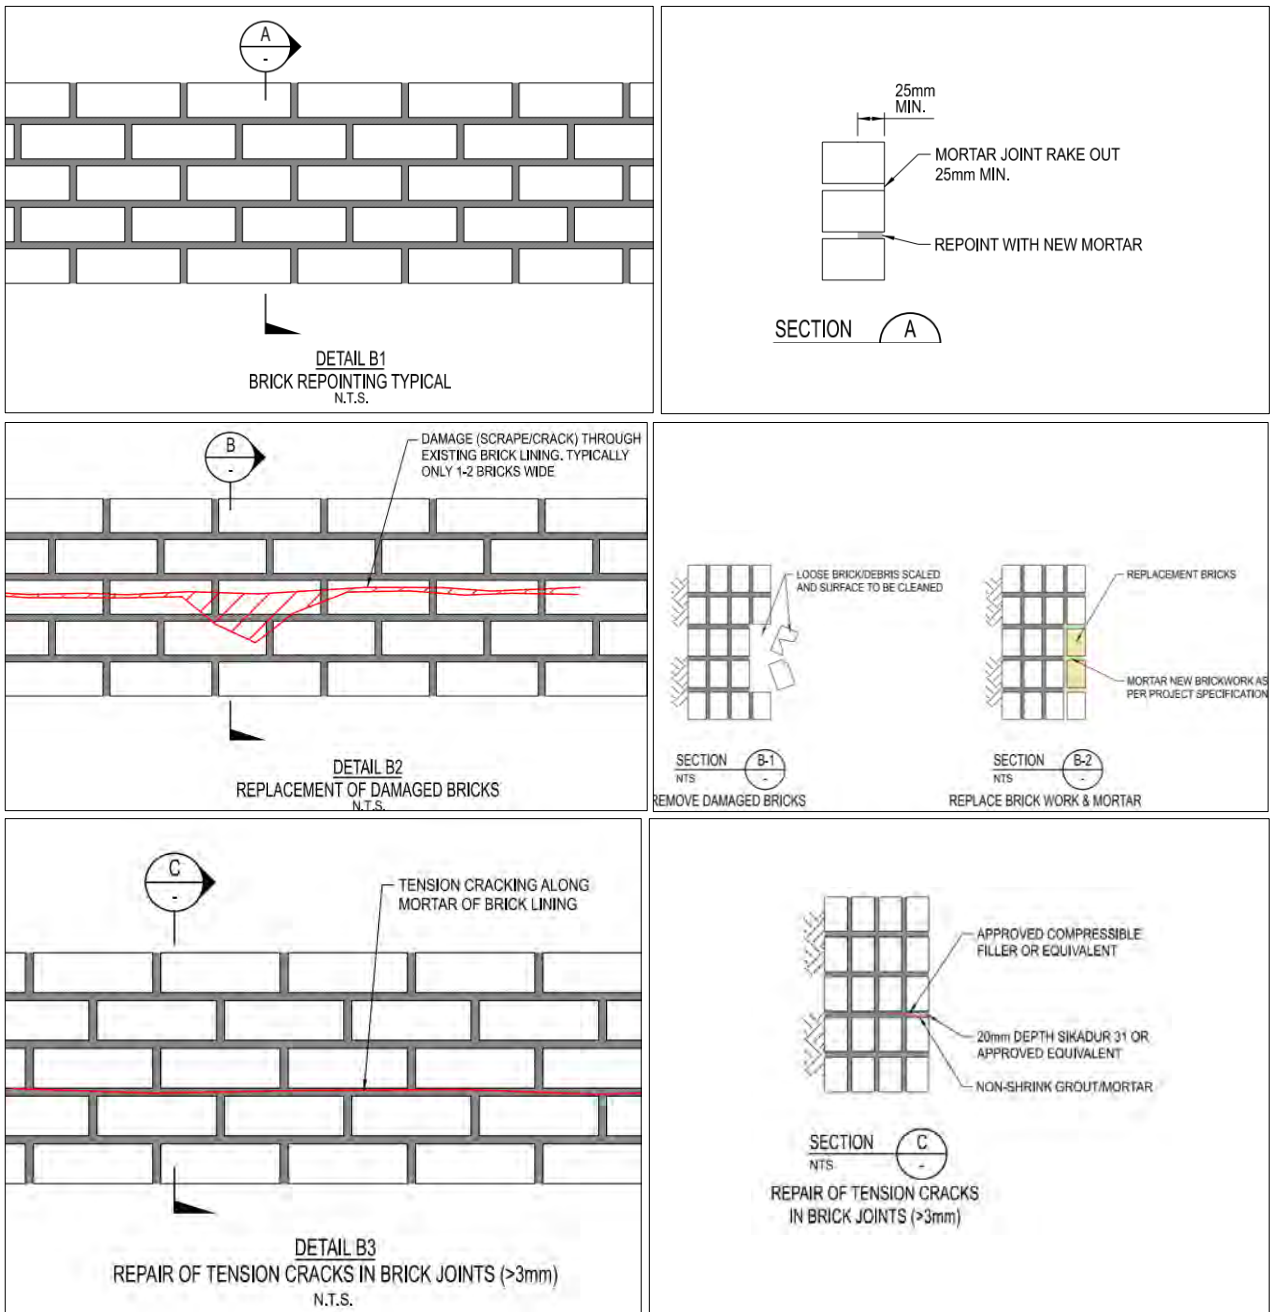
DRAWINGS SHOWING EXISTING TUNNEL LINING REPAIR WORKS. (SOURCE: AURECON/VLINE)
